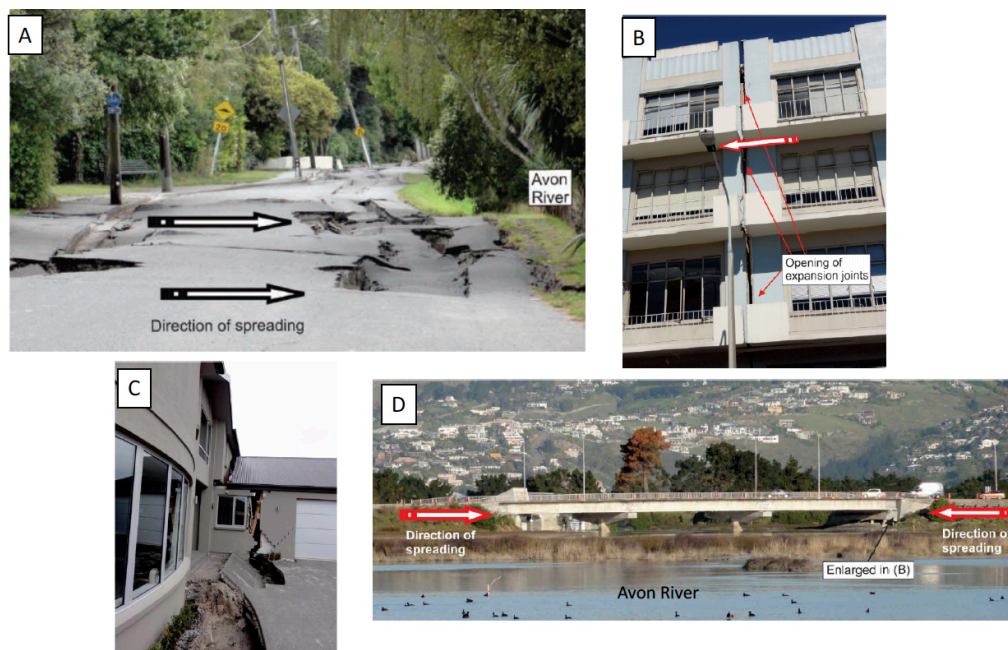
Spreading-induced damage to roads, CBD buildings, residential buildings and bridges observed in the 2010-2011 Canterbury earthquakes
